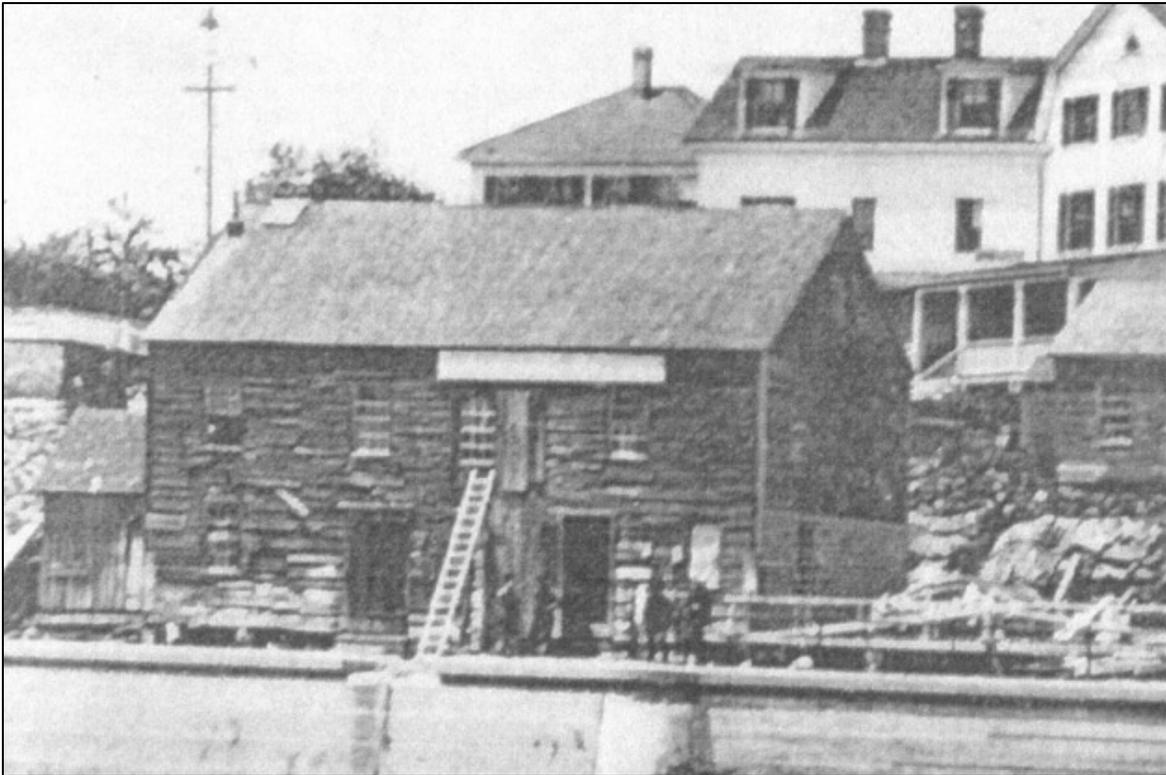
Detail of Figure 66, showing dilapidated condition of Pedrick Store House ca. 1904-05, just before alterations began.
